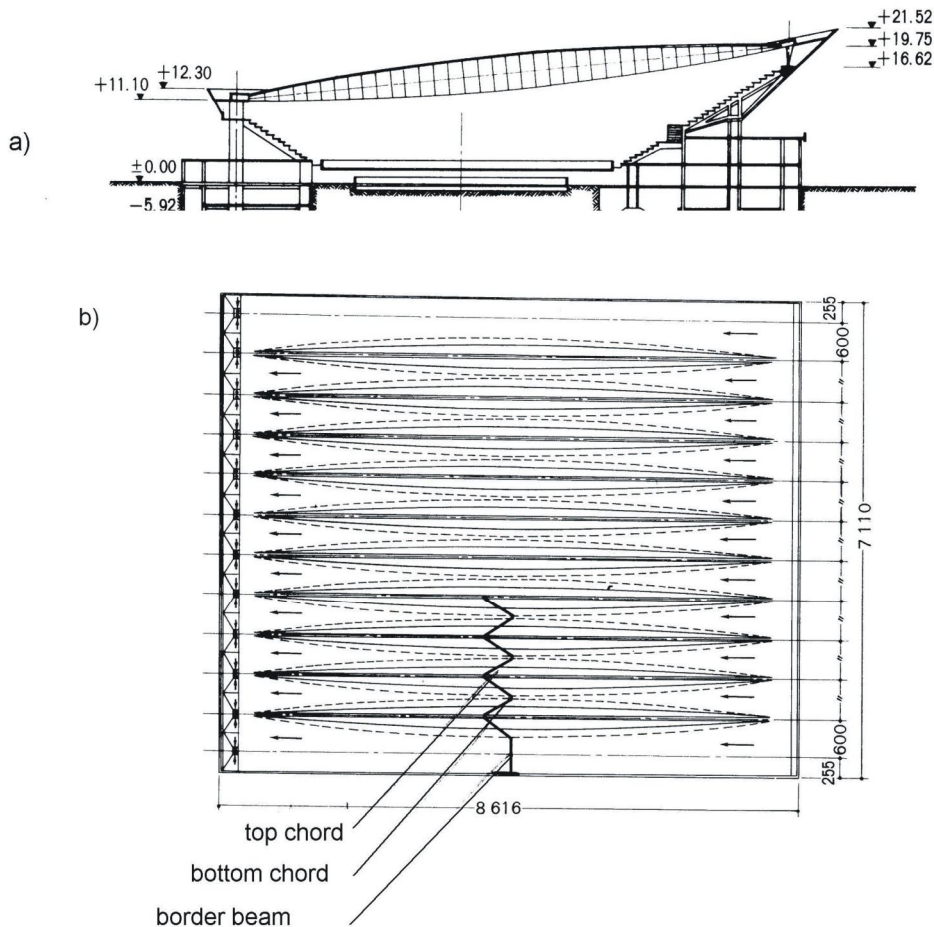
Section and plan of the Olivia Hall in Gdansk (Poland). The steel structure is parabolic curved as well in vertical as in horizontal plane.
